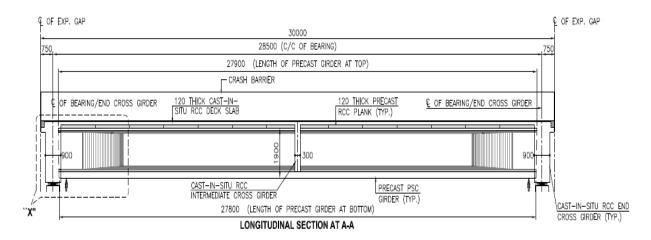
Longitudinal Girder Section of 30m c/c exp joint
